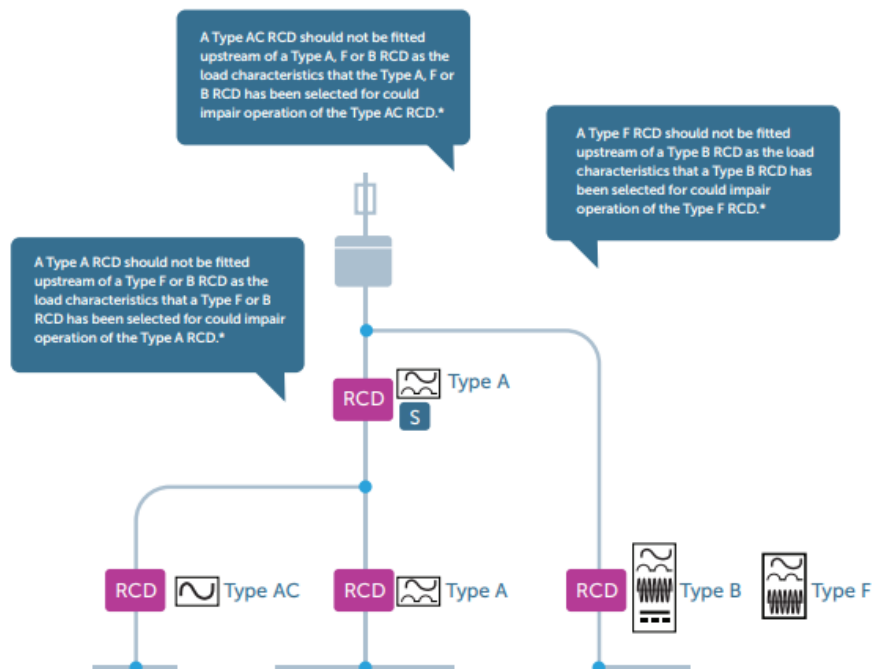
EXAMPLE INSTALLATION ARRANGEMENT
